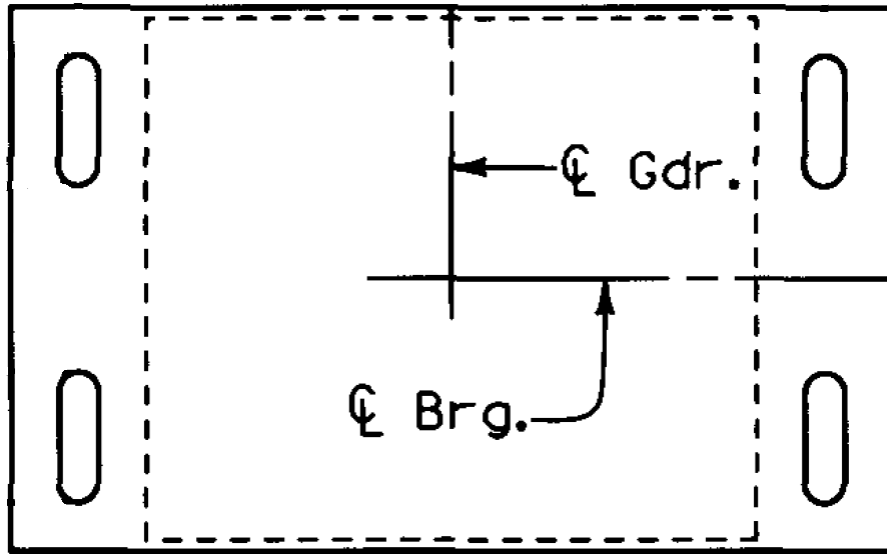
Sole Plate Plan View (ALDOT, 2018)
